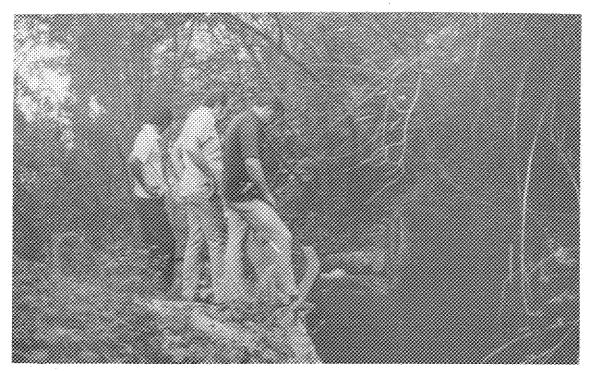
The Waimanalo Irrigation System ditch below the tunnel outlet on Aniani Nui Ridge.
